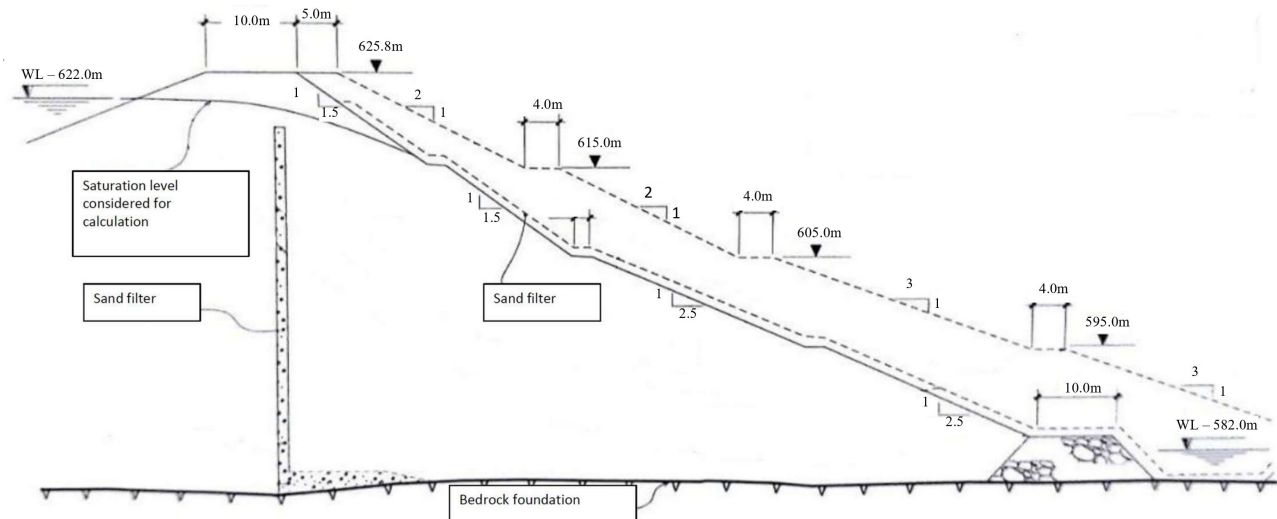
Santa Branca Dam. Typical cross-section (Araújo & Sayão, 2018).
